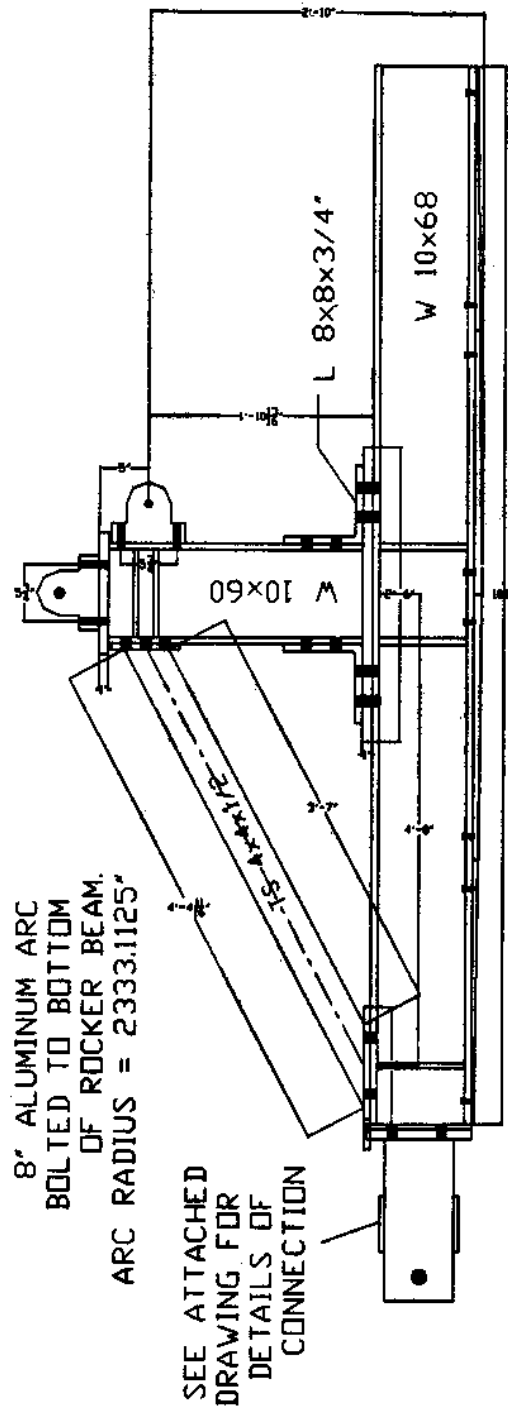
TRANSVERSE ELEVATION OF ROCKER BEAM [12]
